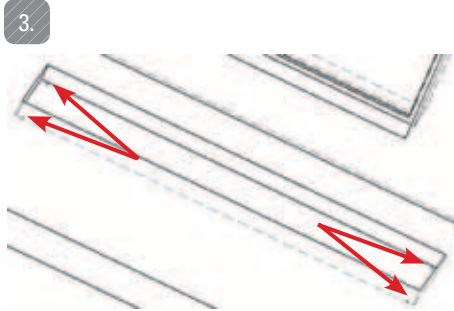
Drill the marked holes ($\varnothing 6$ mm, depth 30–35 mm). Insert screw anchors in the holes.
